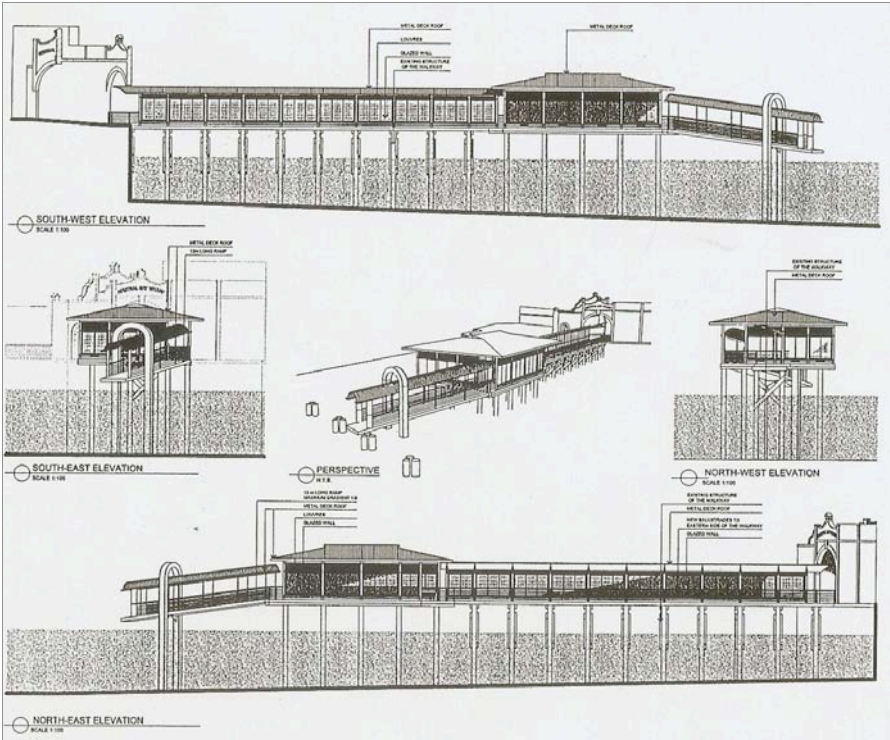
21 & 22 • The 1995 proposal to site a restaurant on a new Hayes Street wharf. The plan shows how the new wharf would be configured, with a waiting and restaurant pavilion. Source: NSC Stanton Library photograph collection.
